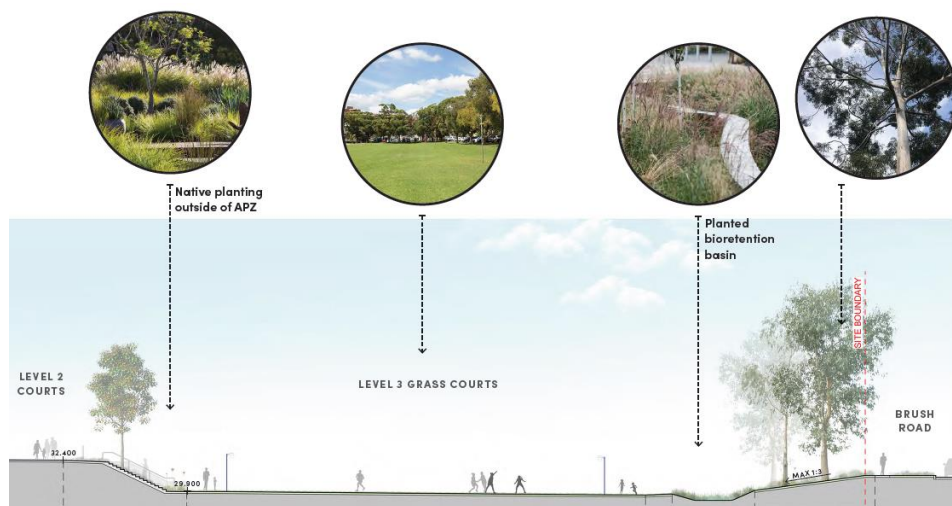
Extract from the Schematic Landscape Design Plan. This Section shows the grass courts, planted bioretention basin and buffer trees along Brush Road (right).
